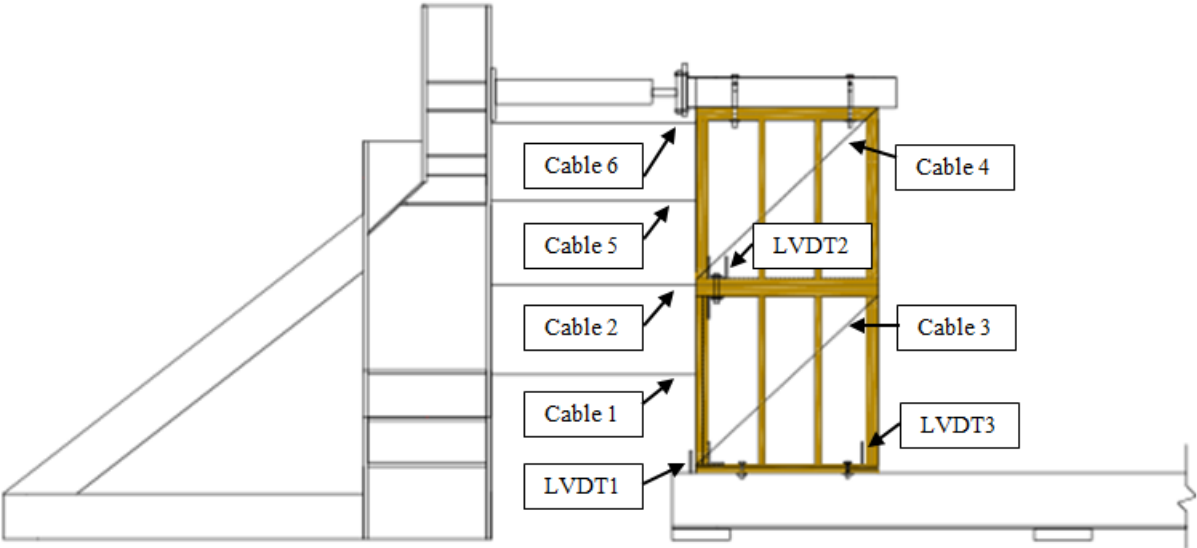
Half-Scale Double Storey Shear Wall Test Setup Schematic (Instrumentation)
